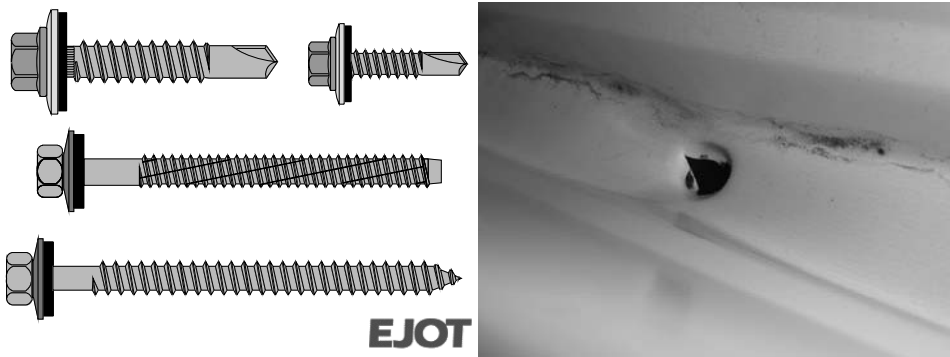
Examples of screw fasteners and failure mode for fixings of steel sheeting.
